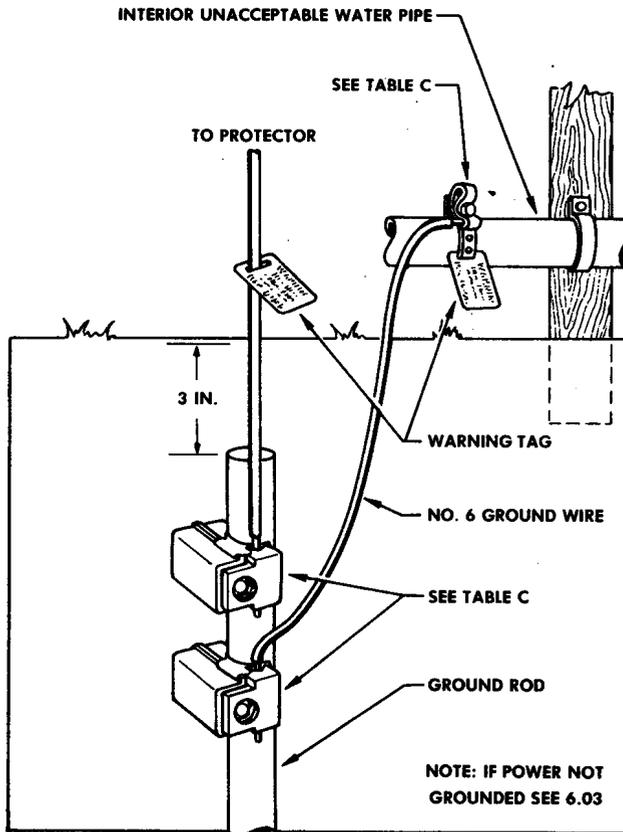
Power Not Grounded on Premises—Unacceptable Water Pipe
